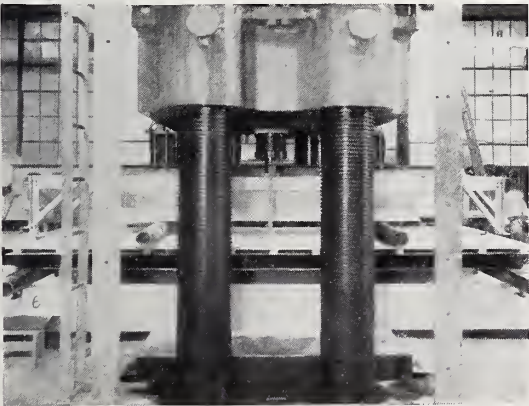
Floor specimen *AY-T1* under transverse load.
